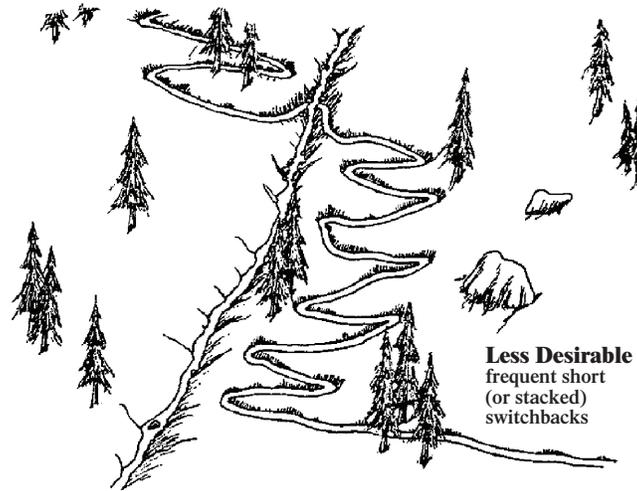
Long sections of trail between switchbacks are usually better than short sections—fewer switchbacks will be needed, with fewer turns to shortcut.
